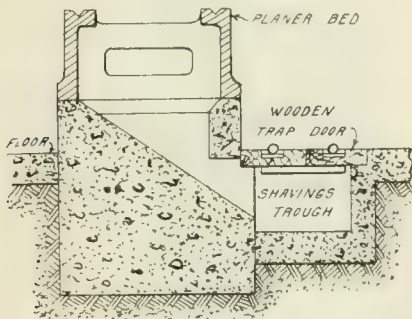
ARRANGEMENT OF POCKET WHEN BASE OF BED IS RAISED ABOVE THE FLOOR
